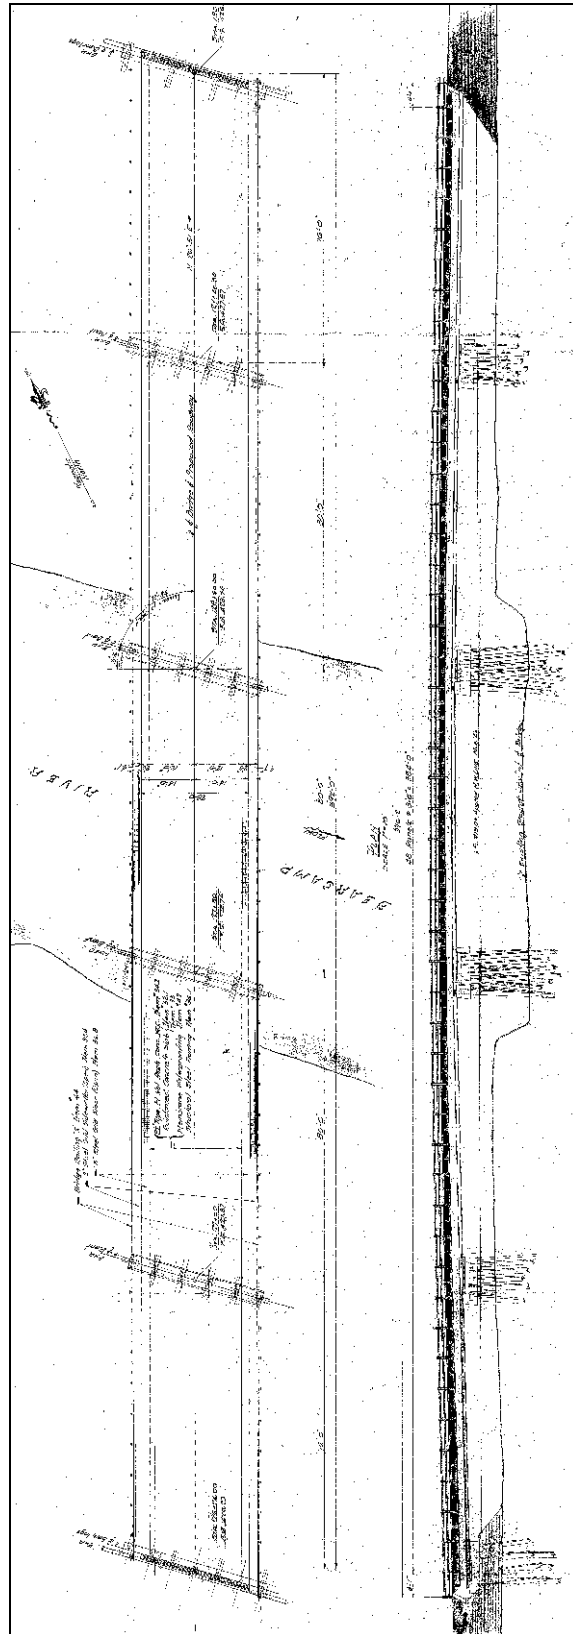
Plan of bridge from original drawings (NHDOT File No. 3-4-3-2).
